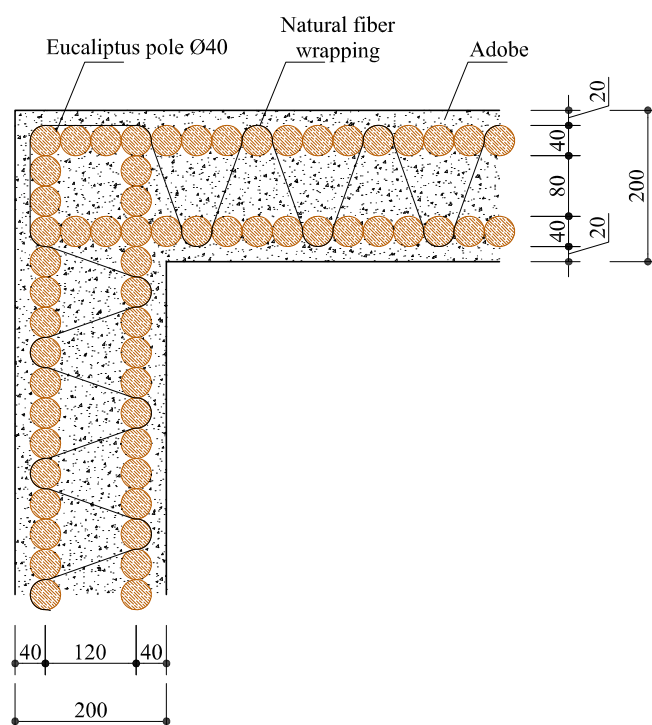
Detail of the wrapping system between the two layers of wood poles in the angles and of the cross connection between two layers.
